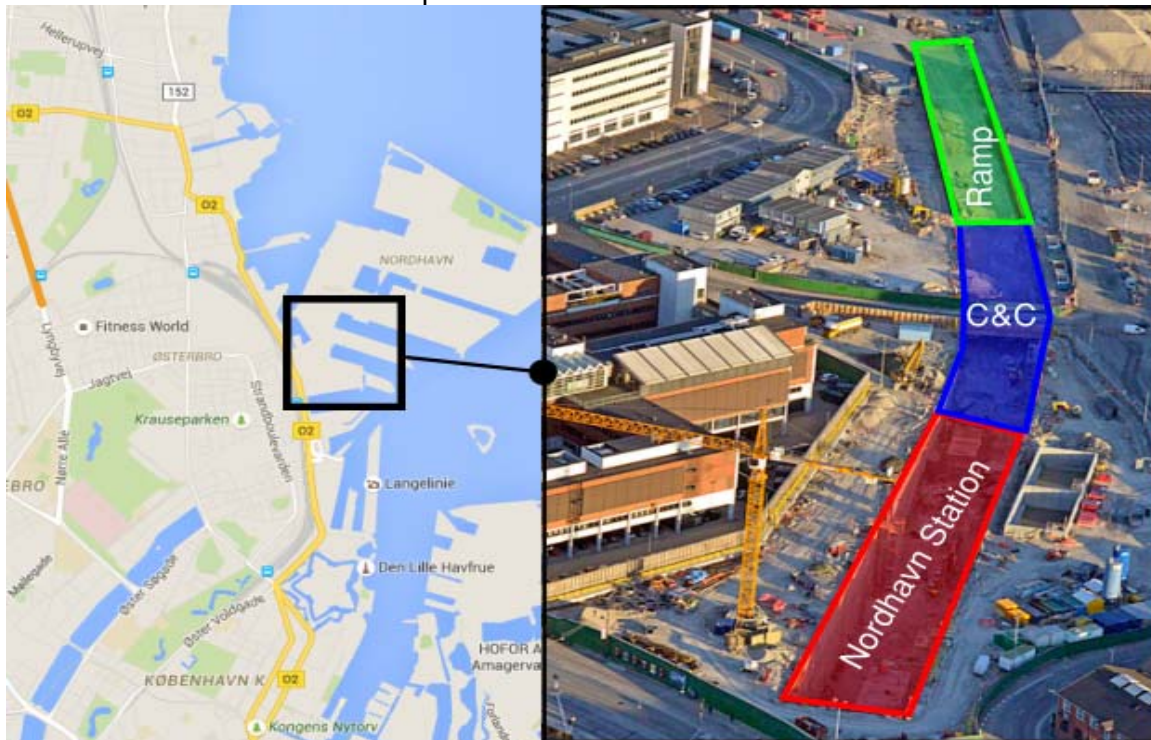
Location of the new underground Nordhavn Station, Cut & Cover tunnel and Ramp
